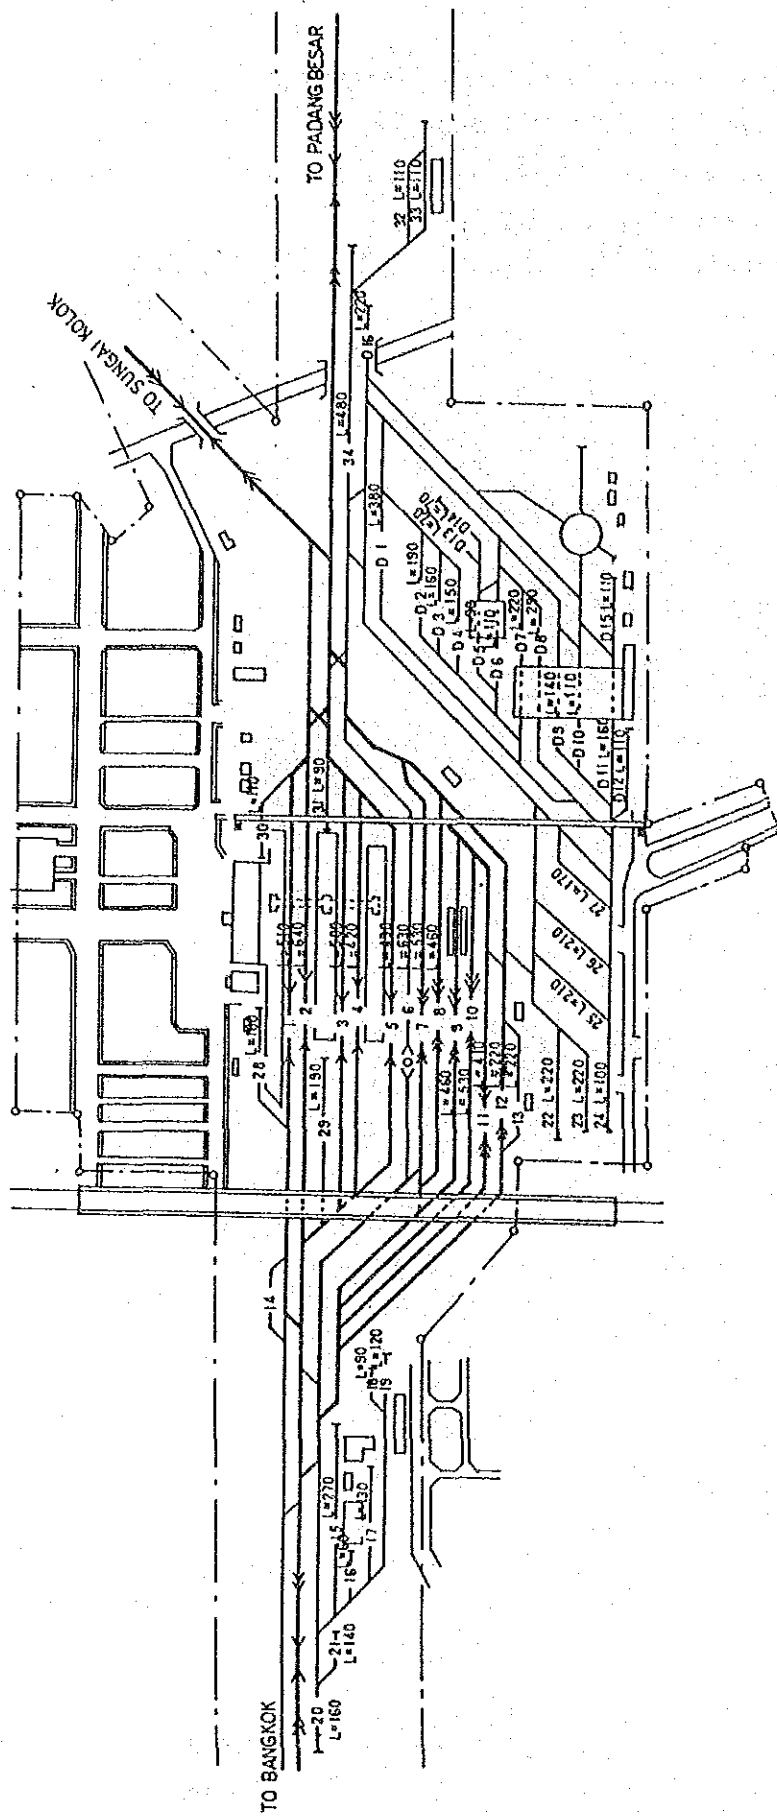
Present Track Layout at Hat Yai Station
